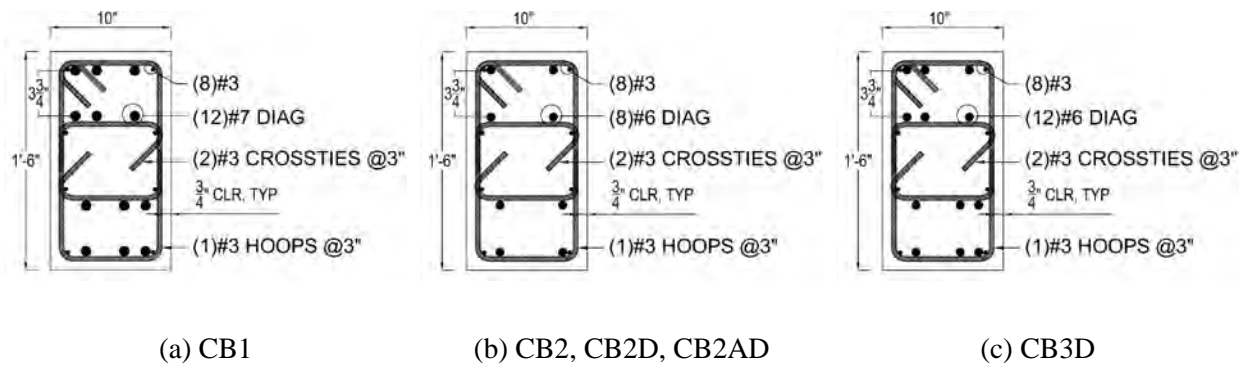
Coupling beam cross-sections near wall intersection (1 in. = 25.4 mm)
